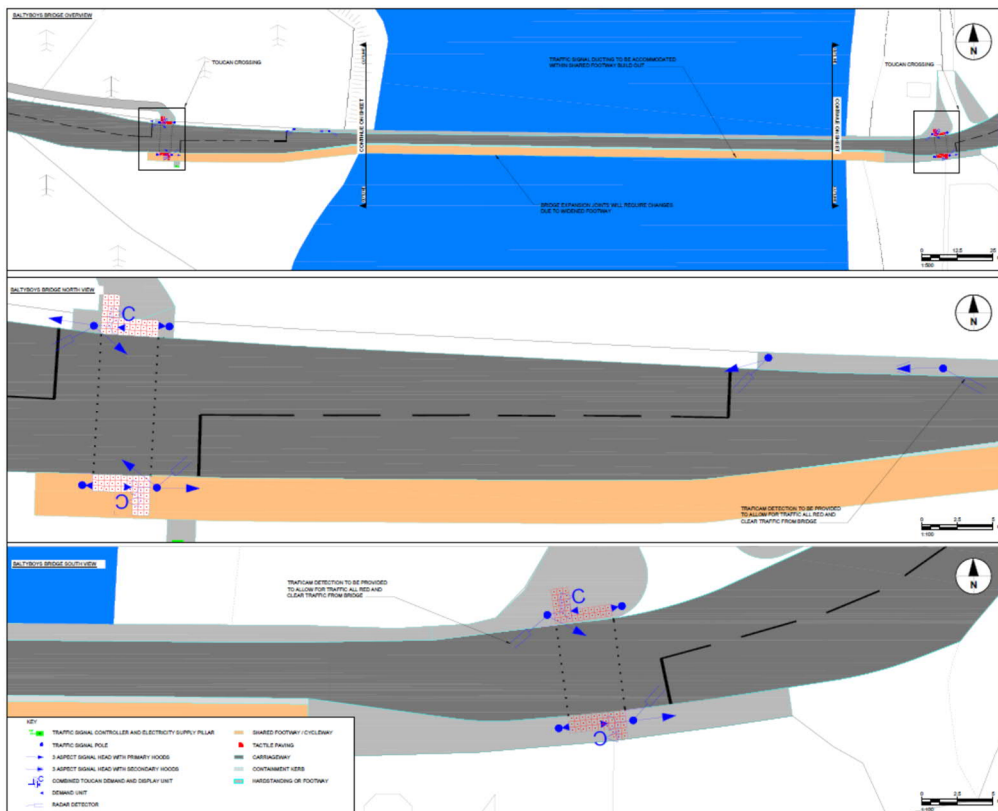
Proposed Shuttle Working Design, Baltyboys Bridge
